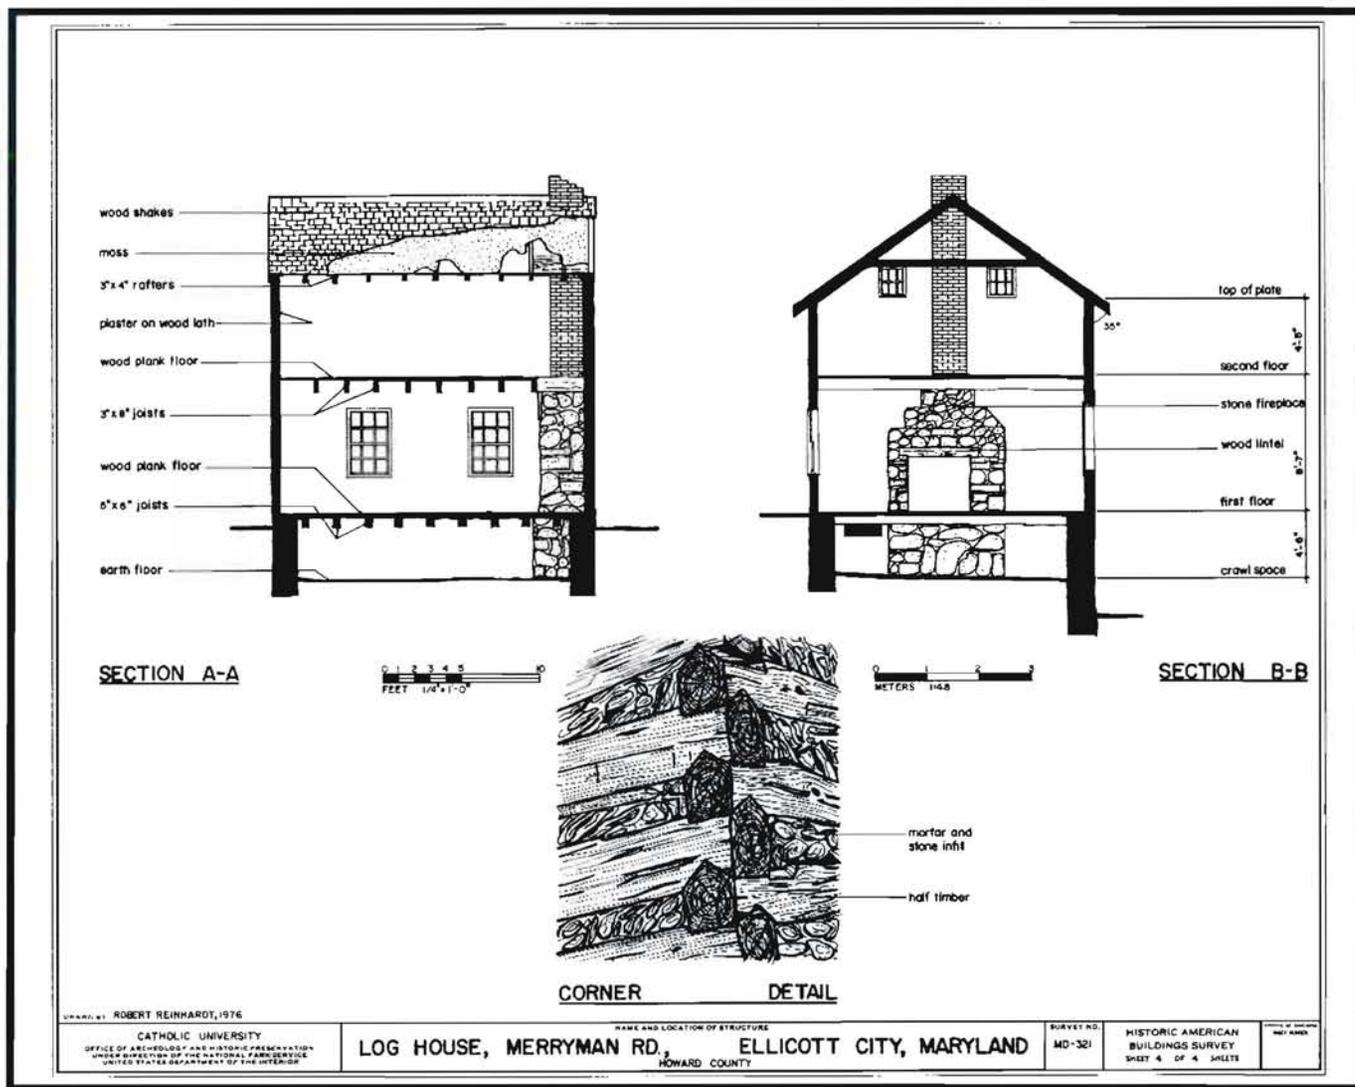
Section Views of the Log House, Merryman RD, Ellicott City, Maryland. This drawing depicts the centrally located interior hearth typical of many log buildings throughout the region. (Historic American Building Survey 1976).
